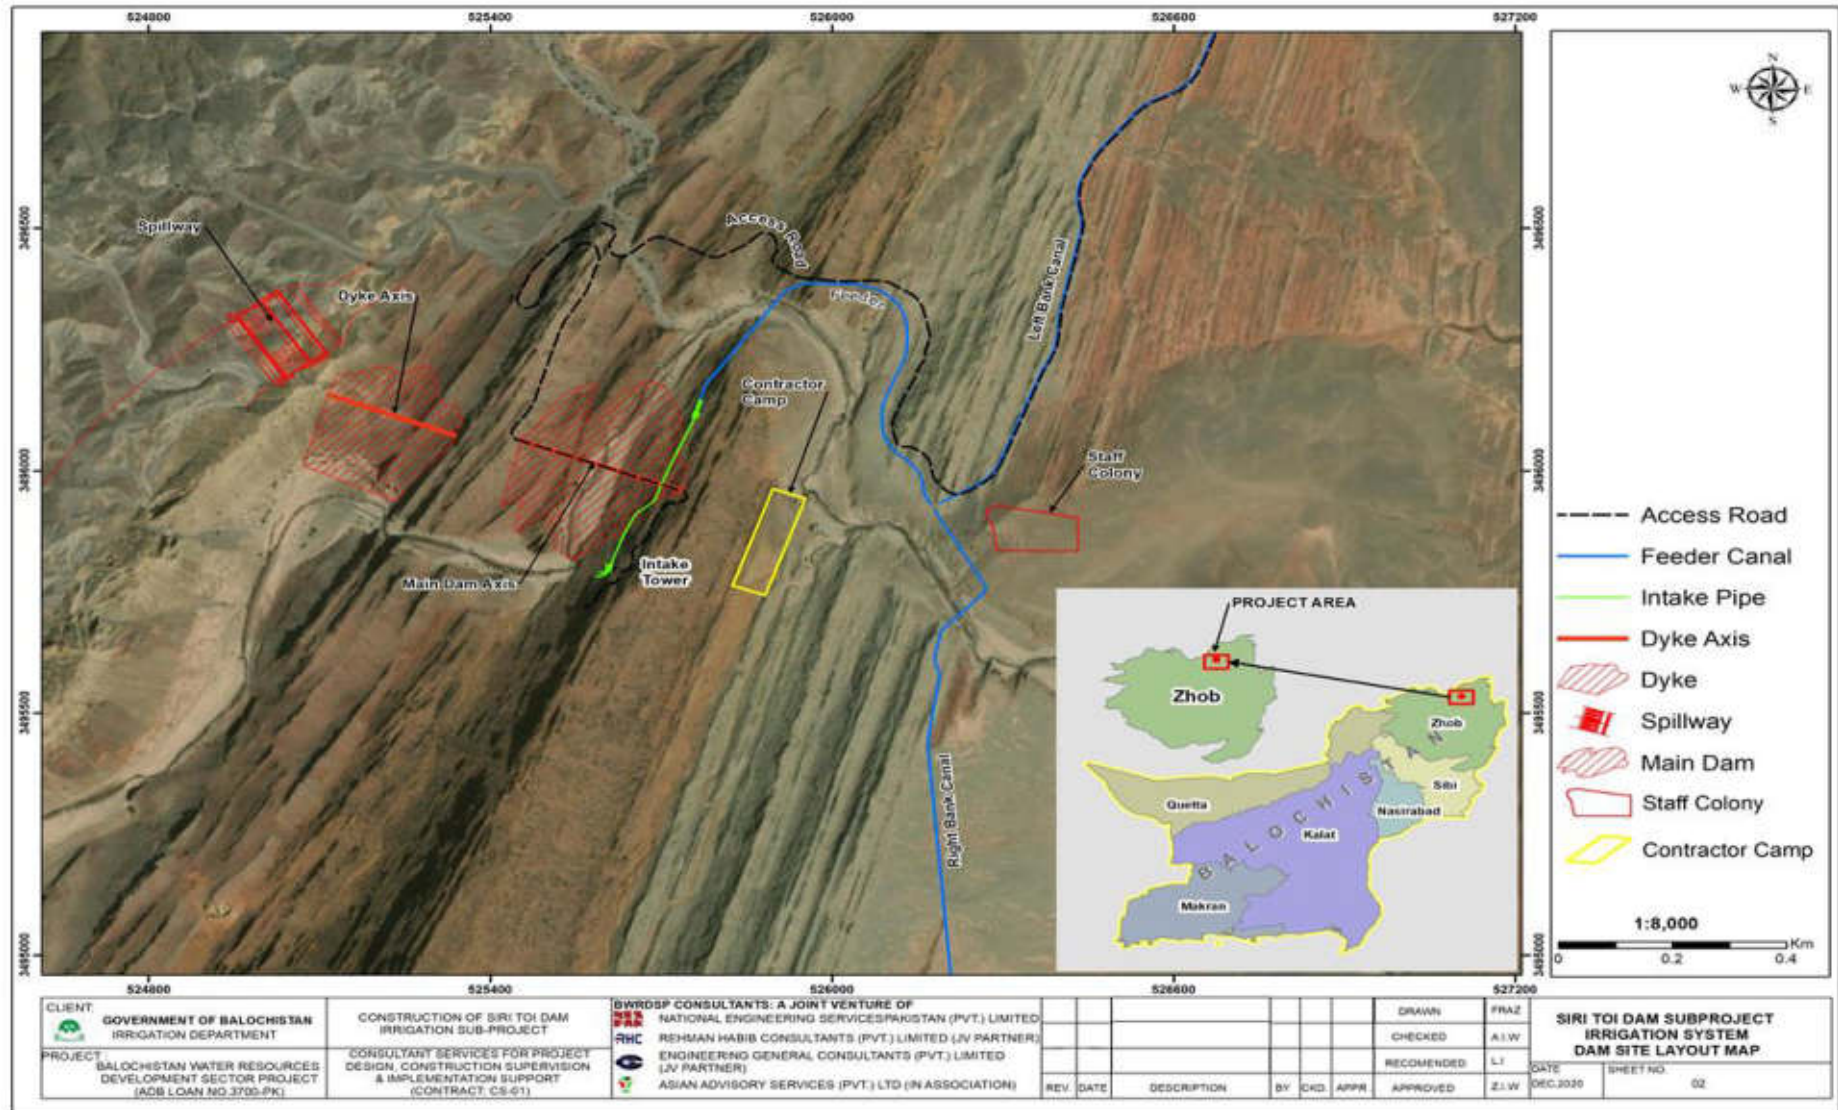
Layout Plan of Proposed Project Interventions (Feasibility Stage)
